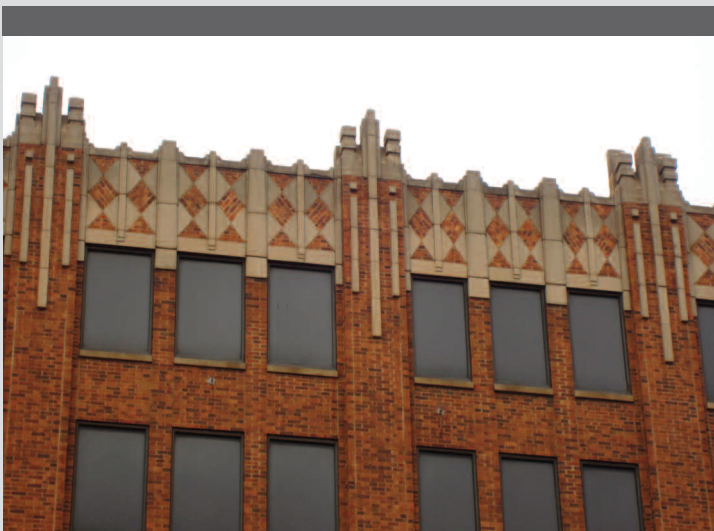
Brick and cast stone capitals and spandrels that were salvaged and reinstalled as an interior architectural feature in the new construction.
